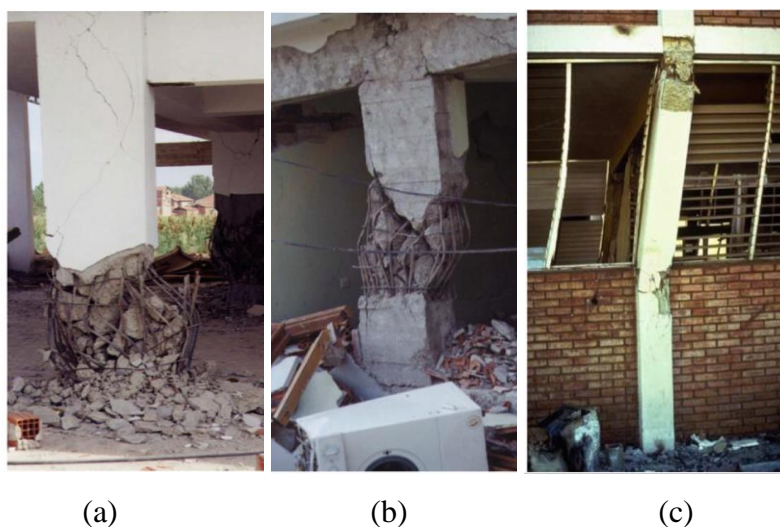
(a) Column Buckle At End (b) Shear Failure (c) Short Column Failure (Saatcioglu, 2013).
